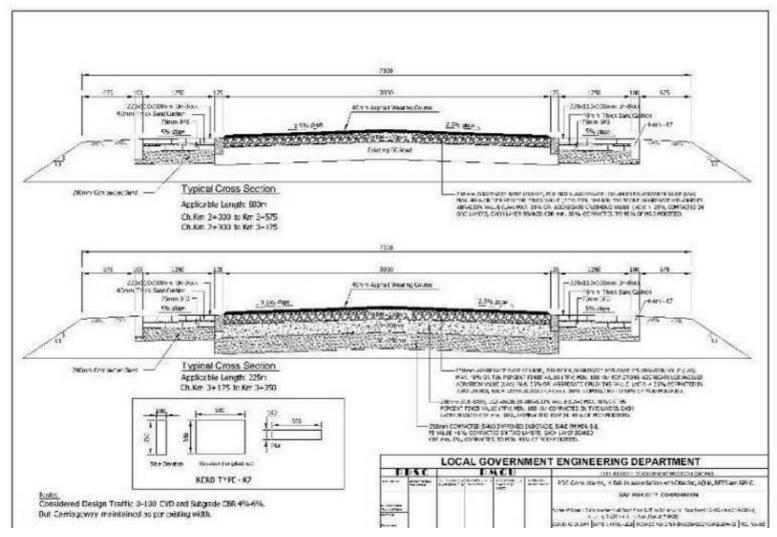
Cross section of the Road (Ch. 2+000 to 2+575 km) & (Ch. 2+900 to 3+125 km) Road from IUT to Icharkandi Road from Ch.0+000 km to Ch.4+050 km, including 0.200 km Link Road and 2.625 km long Signboard to Kamarjuri road (Road ID: LRG6)
